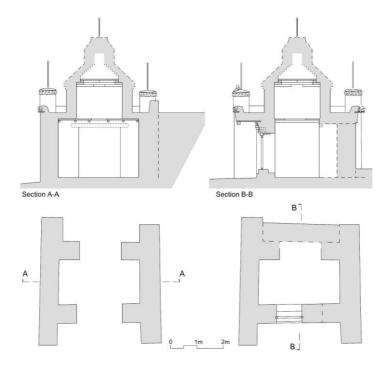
Floor plans (original plan left, new plan with blocked passage right) of Tashigang stūpa with related section. (Drawing Kozicz)
